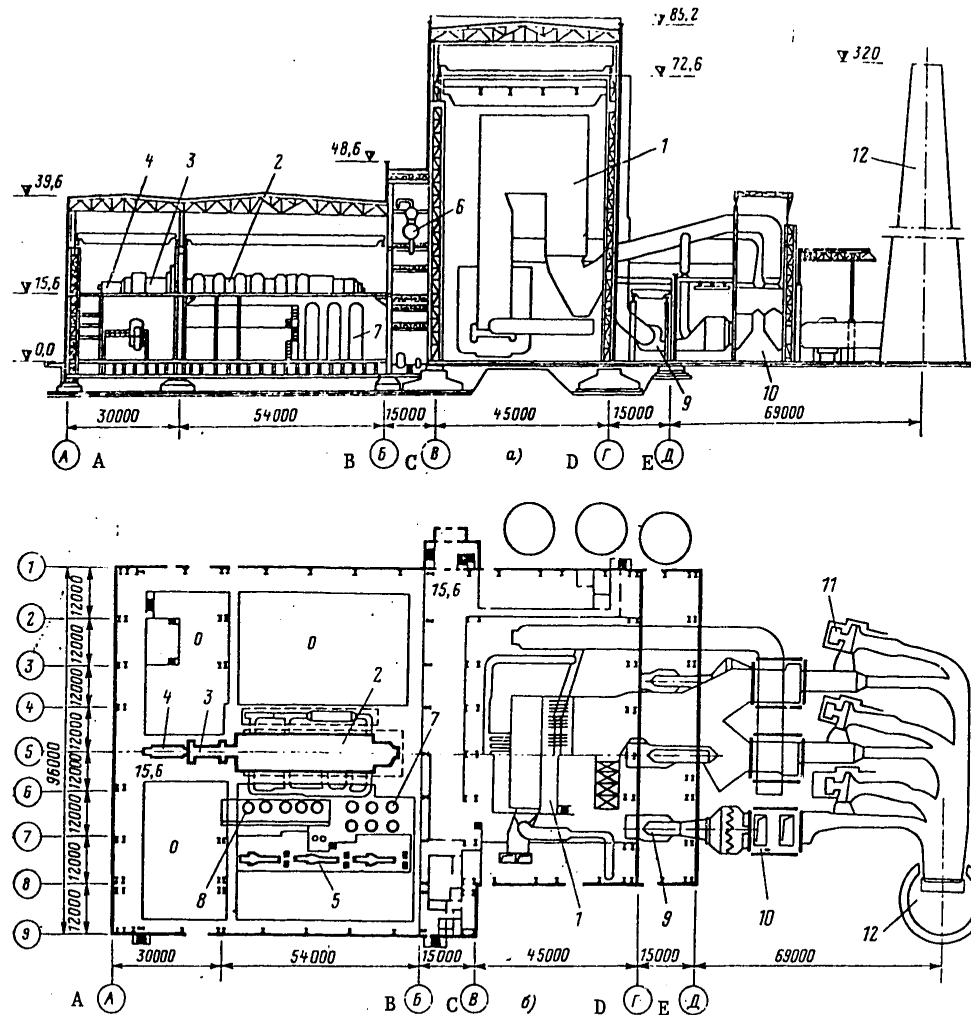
Diagram of arrangement of main equipment in main building. a) cross section; b) layout. 1) single-pass single-housing boiler; 2) turbine; 3) generator; 4) exciter; 5) feed turbopump; 6) deaerator; 7) high-pressure heaters; 8) low-pressure heaters; 9) blower; 10) regenerative rotating air heater; 11) smoke exhaust; 12) stack
